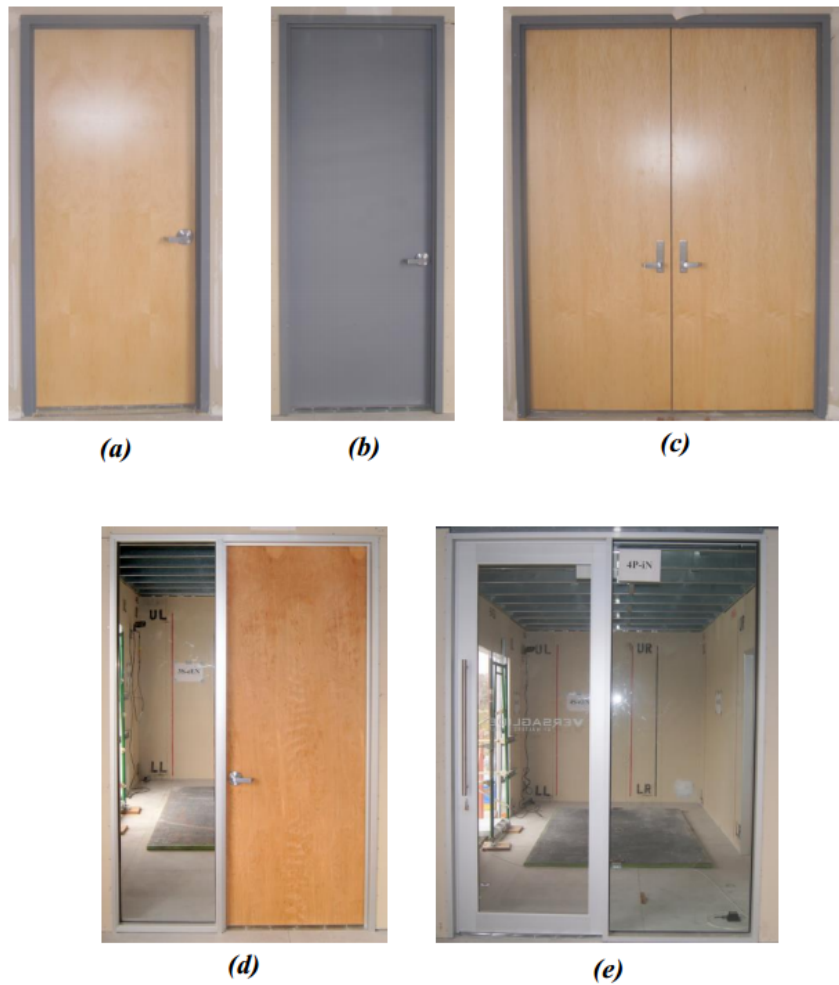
Photographs of the typical door types: (a) single-swing wood door (1.0 m × 2.2 m), (b) single-swing metal door with a 20-minute fire rating (1.0 m × 2.5 m), (c) double-swing wood door (2.0 m × 2.5 m) (d) single-swing wood door with a side lite frame (1.6 m × 2.5 m) (e) sliding door with a side lite frame (2.0 m × 2.7 m).
